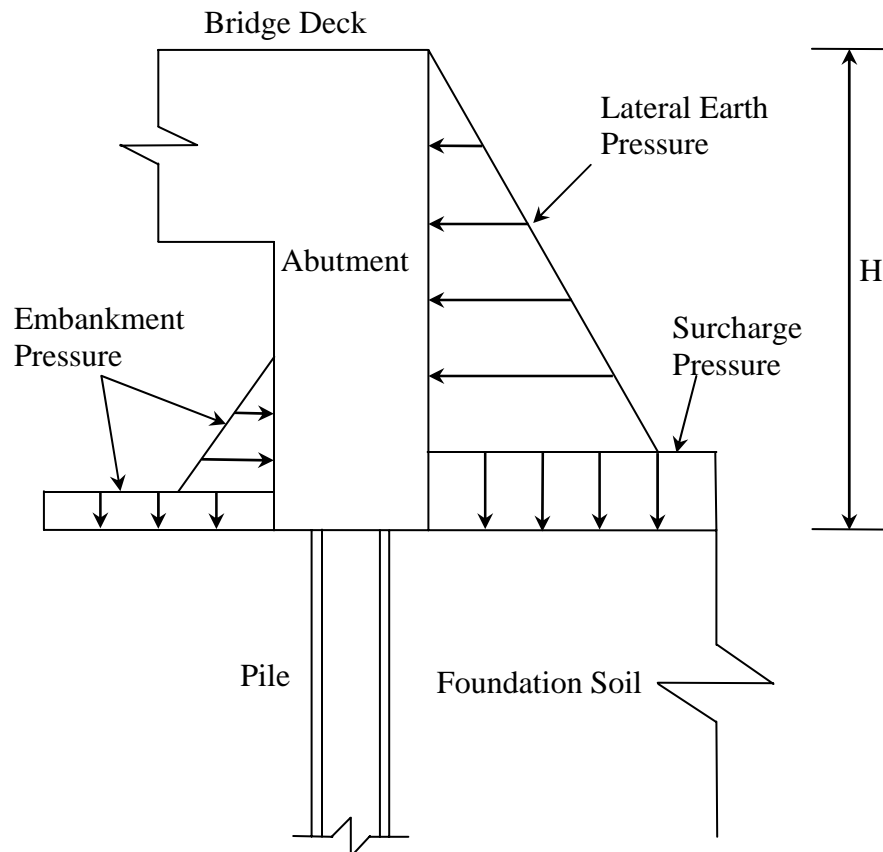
Backfill and Embankment Pressures Distribution on the Abutment and the Foundation Soil
